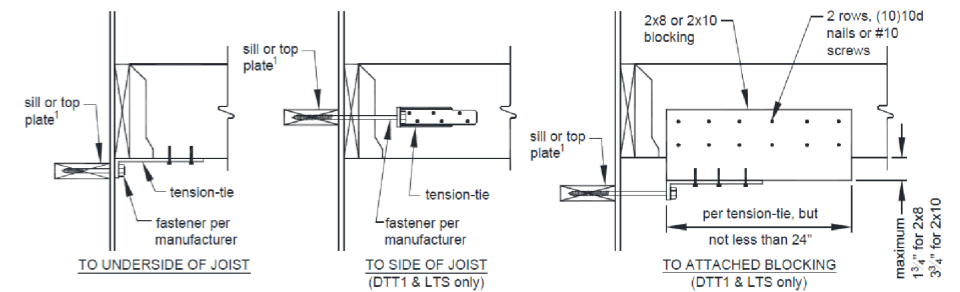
METHOD 1 - TENSION-TIE CONNECTION
